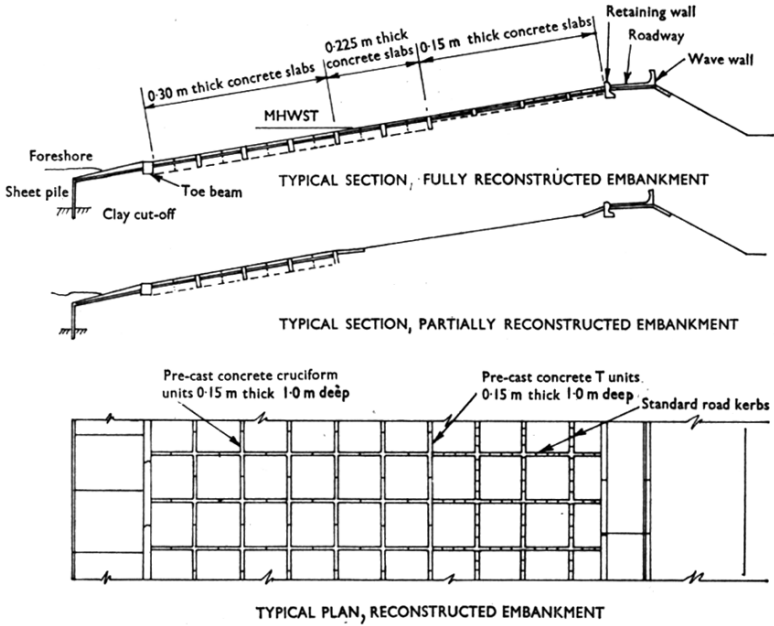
Typical plan and cross-section for stage I of the reconstruction
